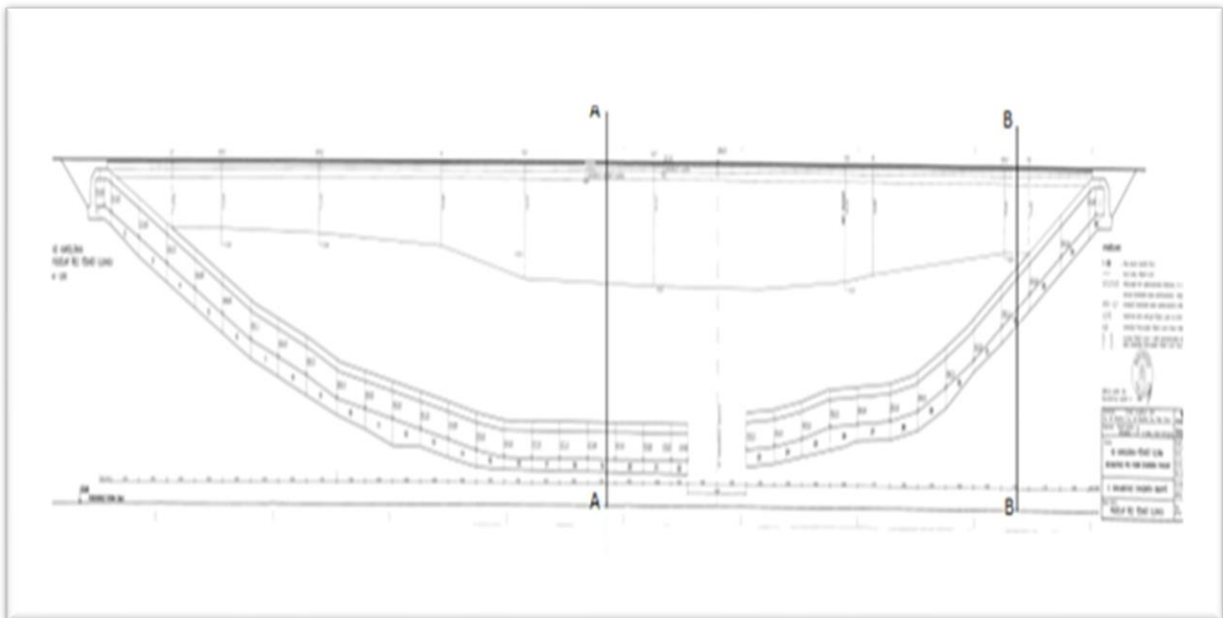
The longitudinal section through the Karolinka dam including constructed wall
